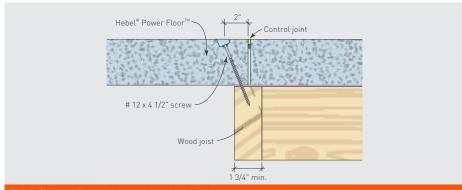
Fixing to Timber Joists at chande in Joist Orientation.
